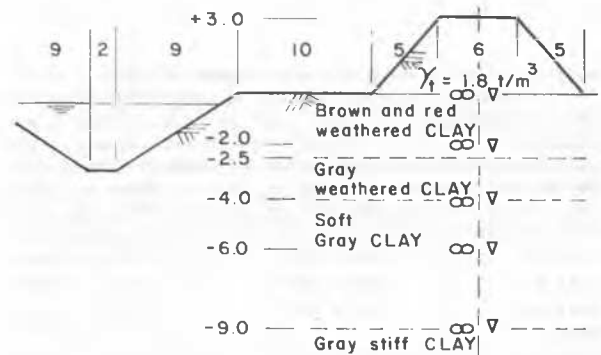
TEST EMBANKMENT AT AIT, RANGSIT
